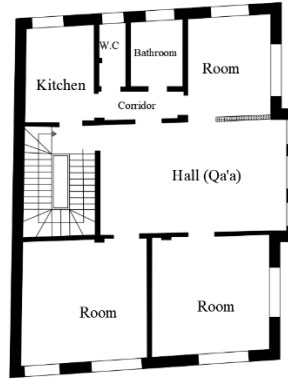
Architectural drawing of the repeated floor built during French mandate between 1920-1946, by Author.
